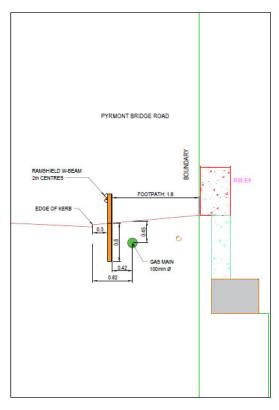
Pyrmont Bridge Road Work Zone, Road Realignment and Public Protection
